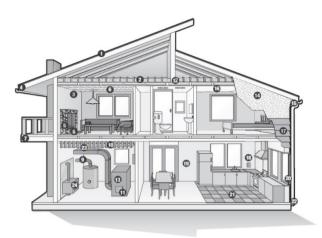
Use of asbestos in materials used in construction. 1. Roof felt and shingles, 2. Loose, blown-in insulation, such as vermiculite, 3. Incandescent light fixture backing, 4. Roof gutters can be made of asbestos cement, 5. Artificial fireplace logs and ashes, 6. Acoustic tiles, 7. Deck under-sheeting, 8. Asbestos pad under the fireplace hearth, 9. Pipe insulation, 10. Main panel and fuse box; each fuse wire has an individual asbestos flash guard, 11. Door and gasket covers, 12. Backing behind recessed lighting, 13. Boiler and furnace insulation, 14. Asbestos can be found in stucco, 15. Soffit boards can be made of asbestos cement or asbestos insulating board, 16. Textured or stipple-coated walls and ceilings, 17. Asbestos cement (transite) board siding and under-sheeting, 18. Outlets and switches, 19. Gypsum board filling compound, and patching and joint compound for walls and ceilings, 20. Window putty, 21. Flooring: vinyl tiles and linoleum sheet flooring; flooring adhesive, 22. Downpipes can be made of asbestos cement, 23. Insulation on electrical wires, 24. Heat reflector for wood stove [6].
